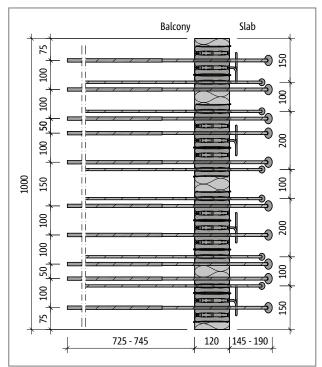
Schöck Isokorb® XT type K-O-M4: Product plan view
